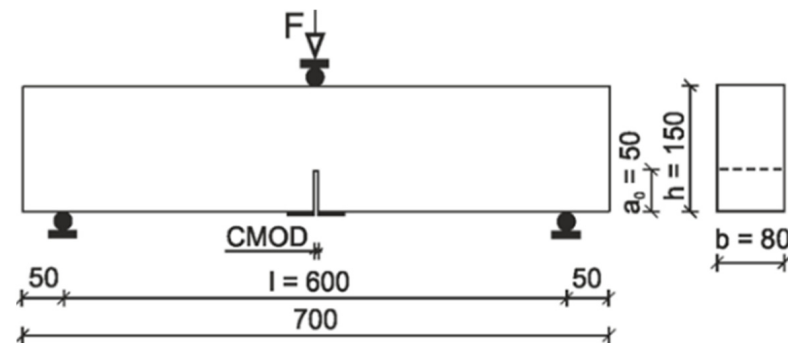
Geometry of notched beam specimens under center-point loading arrangement.
